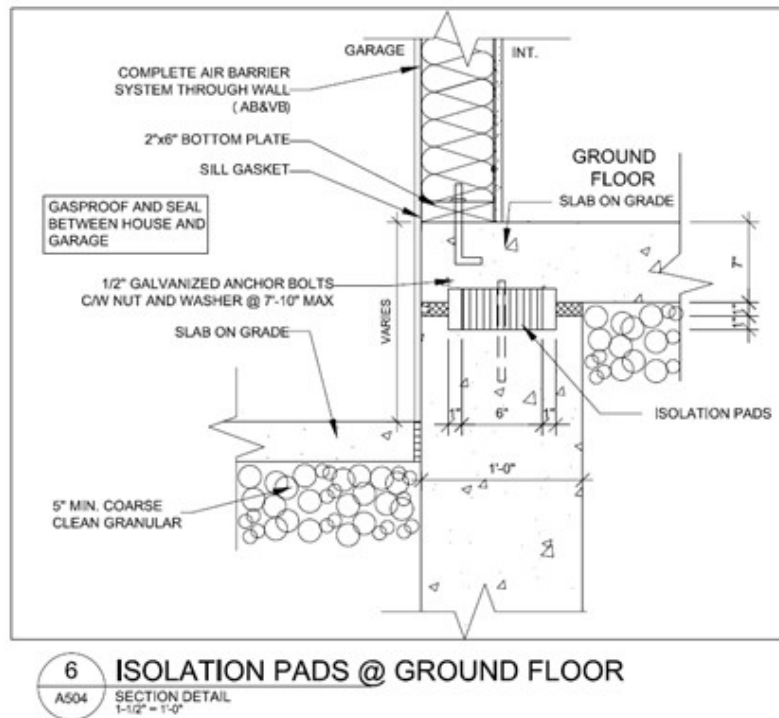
Typical Detail for Isolators at the Ground Floor Level.
